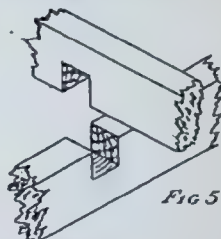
DETAIL OF HALF-LAP JOINT.
